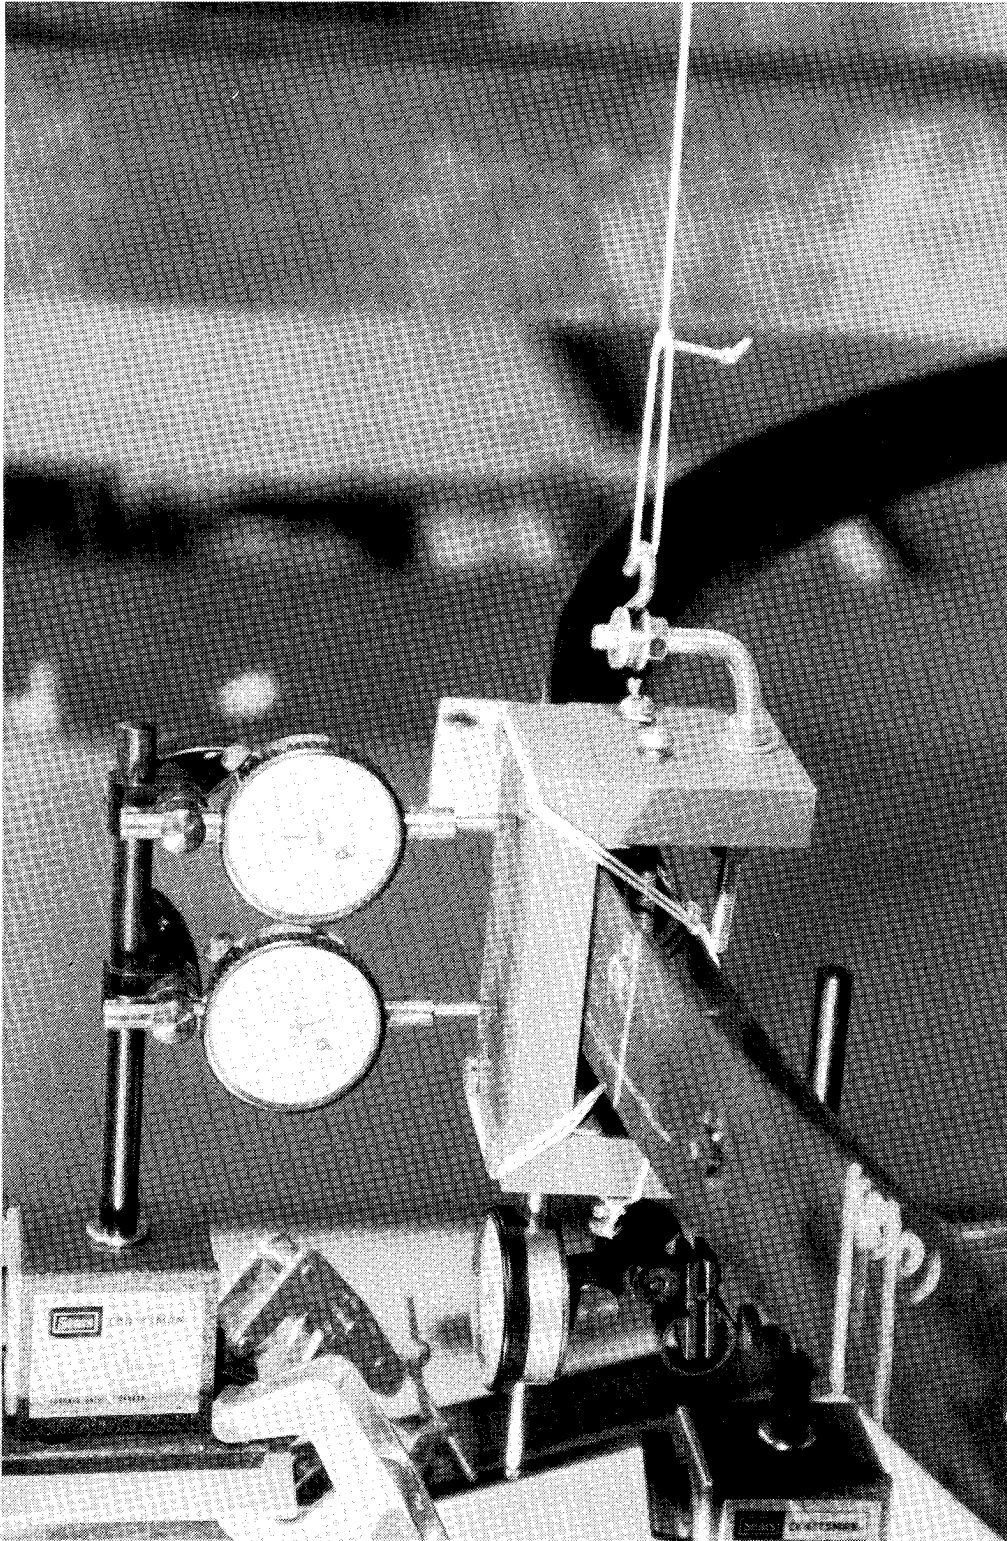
Photograph of modified load fixture and dial indicators: Dial indicators were used to measure the displacement of the load fixture at the midspan. The load fixture was tied to the specimen to force them to deform as a rigid body.
